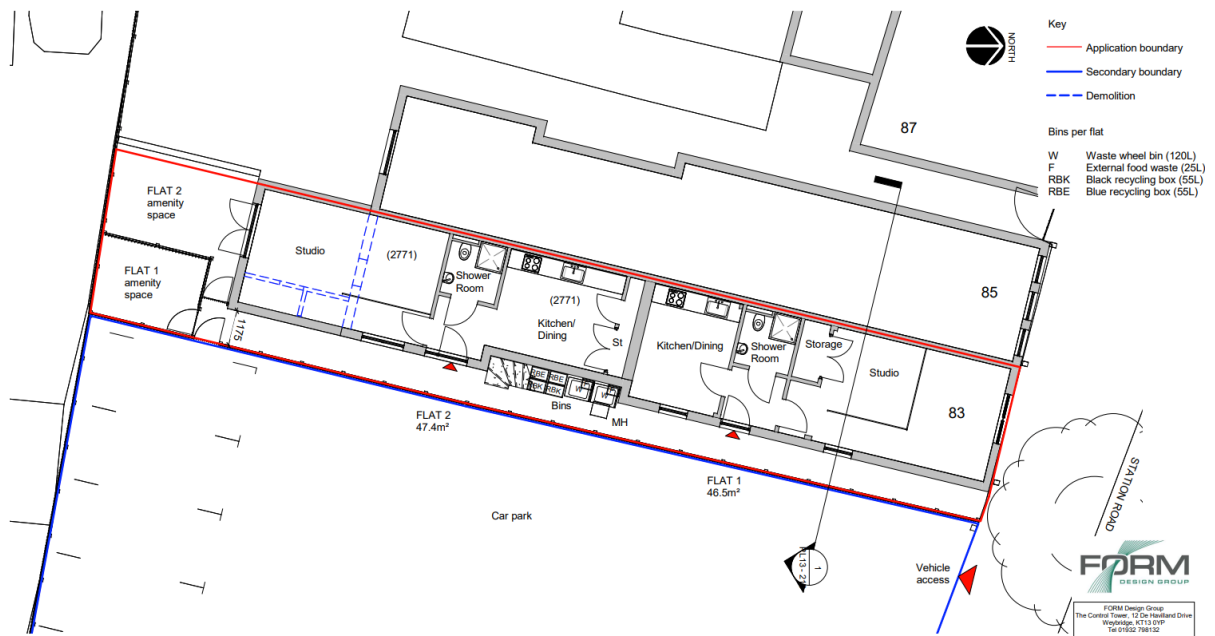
Proposed Ground Floor Plan for 83 Station Road.
